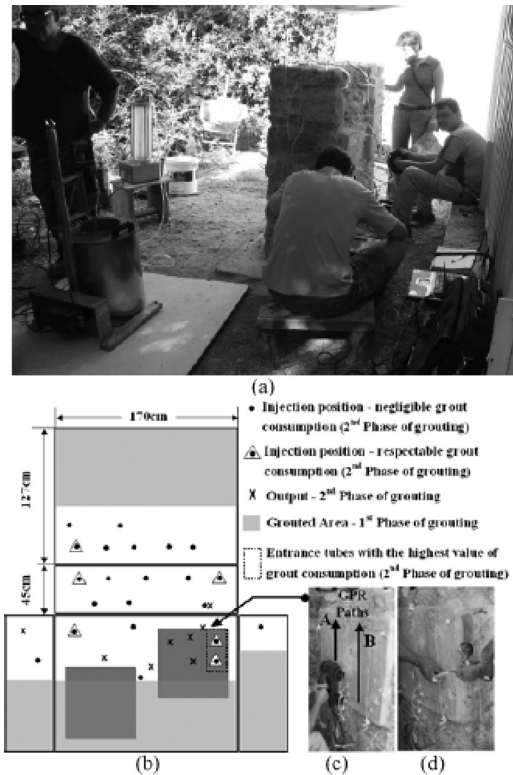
(a) Test masonry wall with the grouting devices on the left and the radar team on the right, (b) Schematic representation of the test wall – 1st and 2nd Phase of grouting, (c) Mortar structure attached to the test wall, simulating the mosaics substrata – GPR Profiles, (d) Application of the 5th injection of the 2nd phase, situated close to the tested area.
